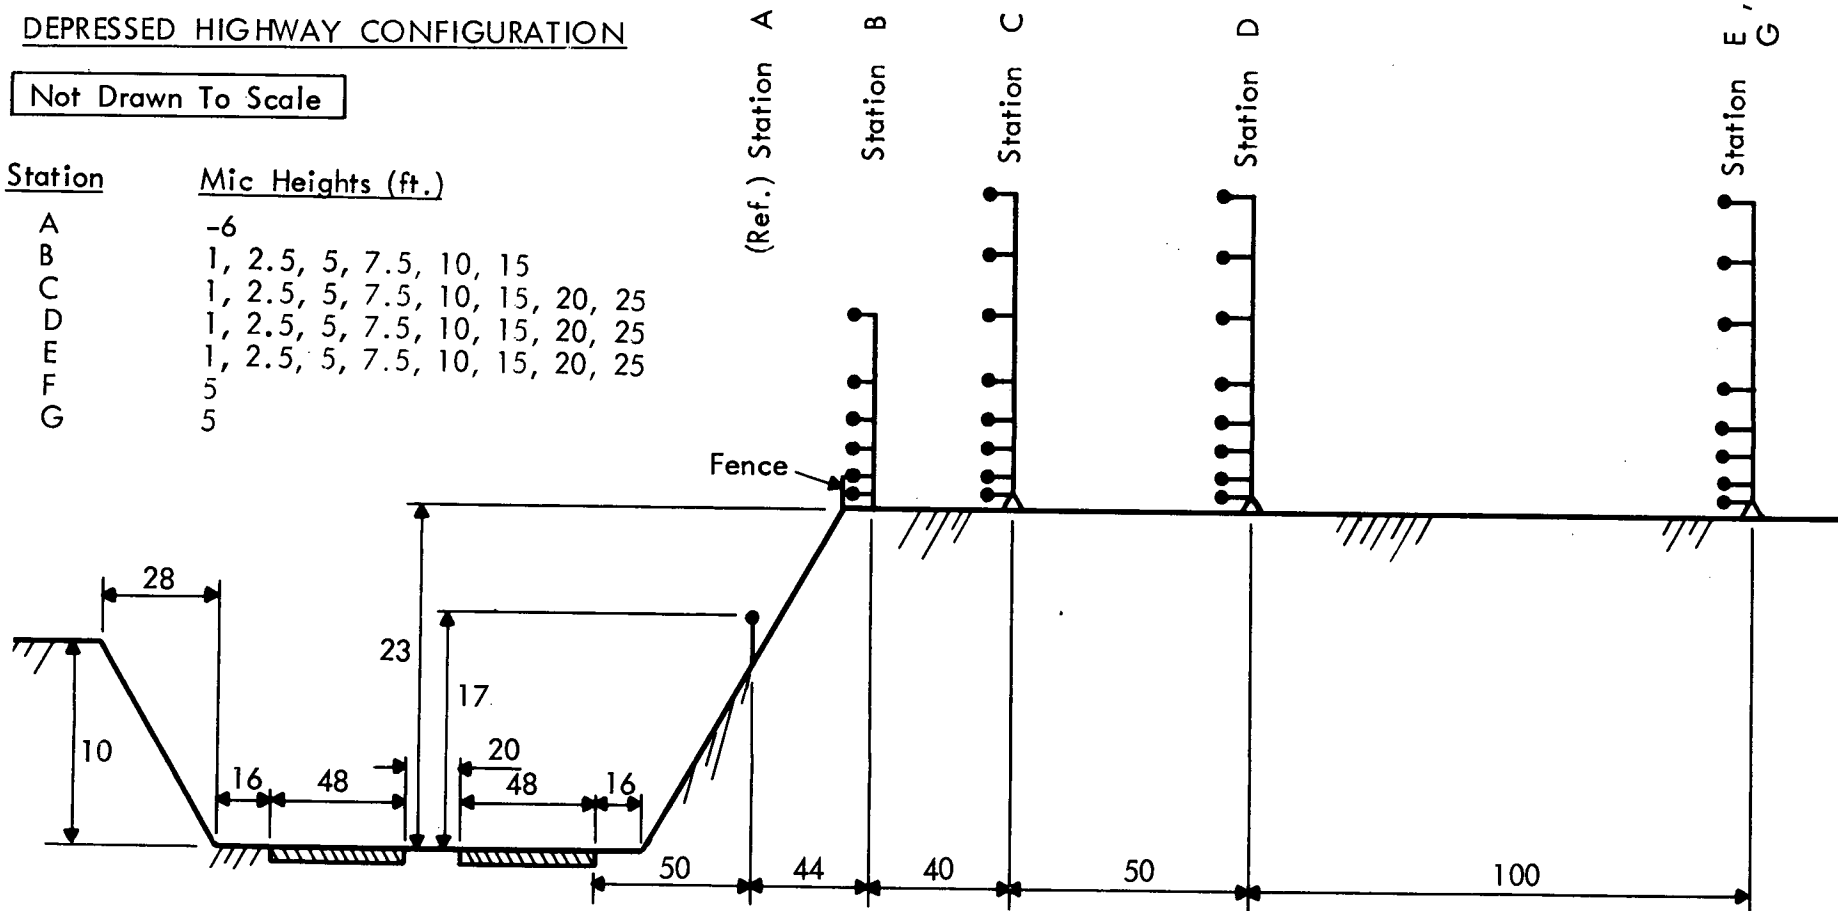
Site cross-section and acoustic measurement stations, Site 9.
